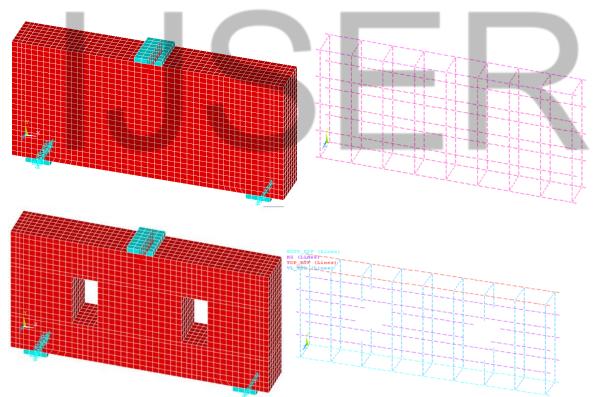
the loading system, meshing, and details of reinforcement for specimens in ANSYS
